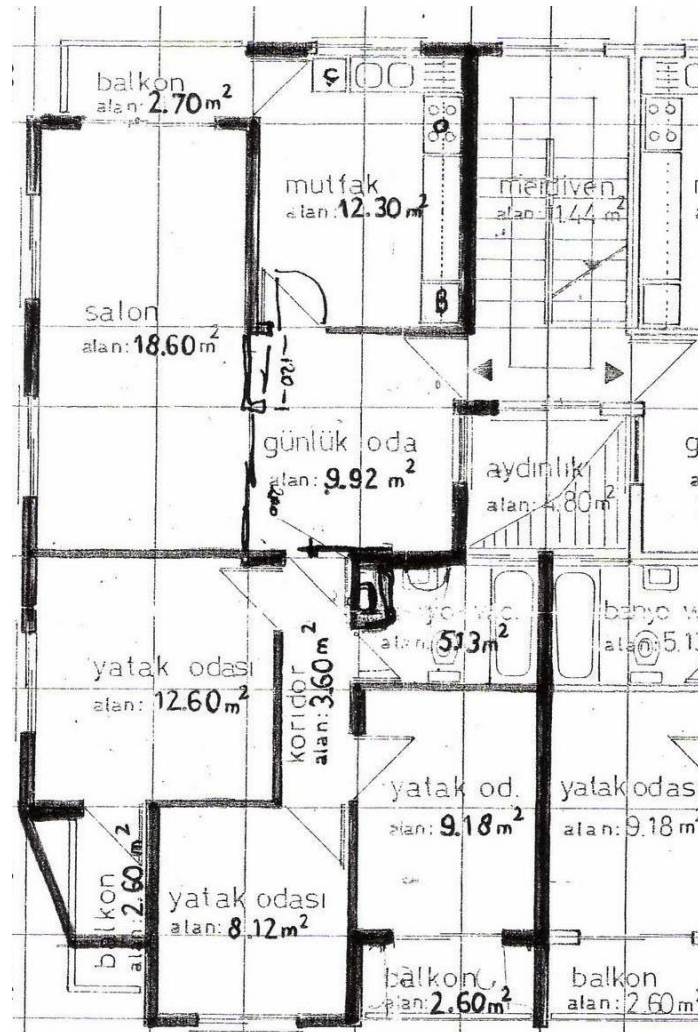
A typical floor plan from one of the first examples of commercial apartment housing, Levent Complex 1985-1987, Ortaköy, Nicosia.
